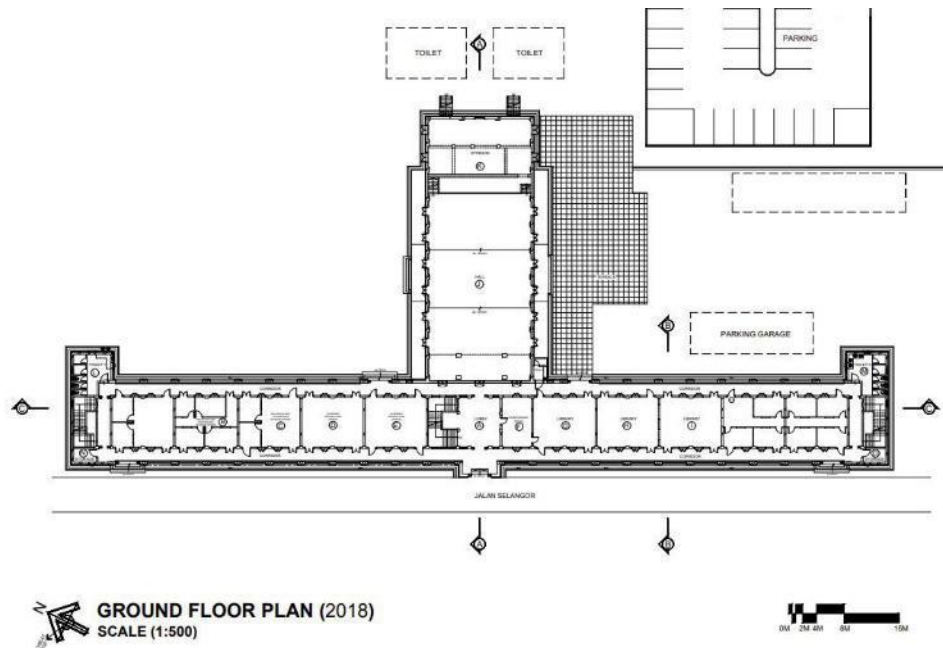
Ground Floor Plan of Batu Lama School (2018)
